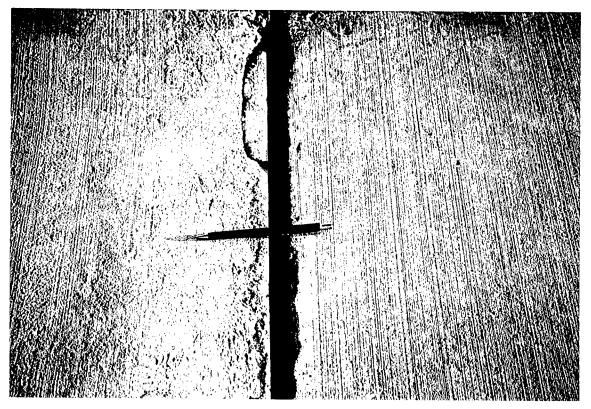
Typical low-severity joint spall on the Avum Hanger Apron
